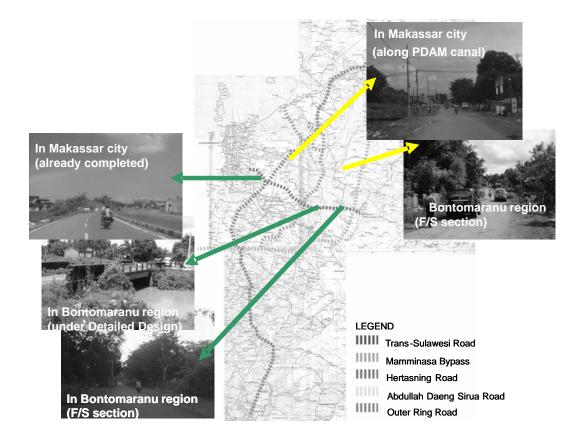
Typical Site Conditions of Hertasning and Abdullah Daeng Sirua Roads
